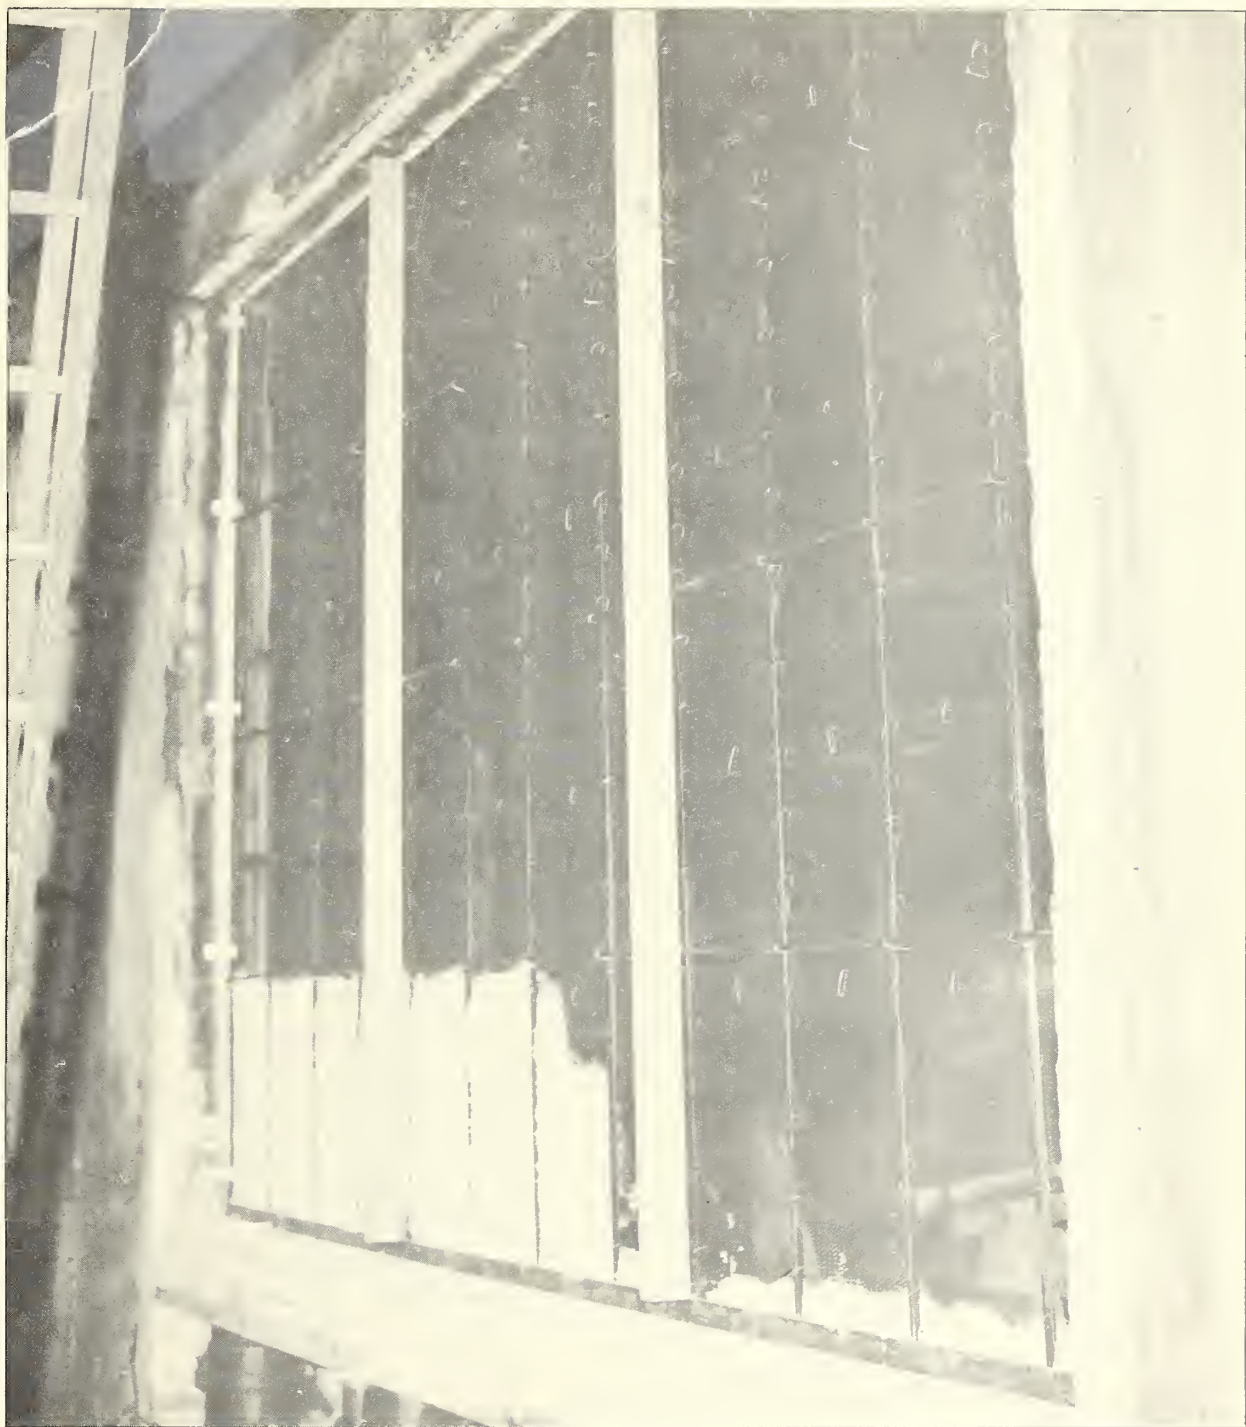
Partition for test 298 at start of plastering. The wood members and horizontal channels were temporary bracing.
